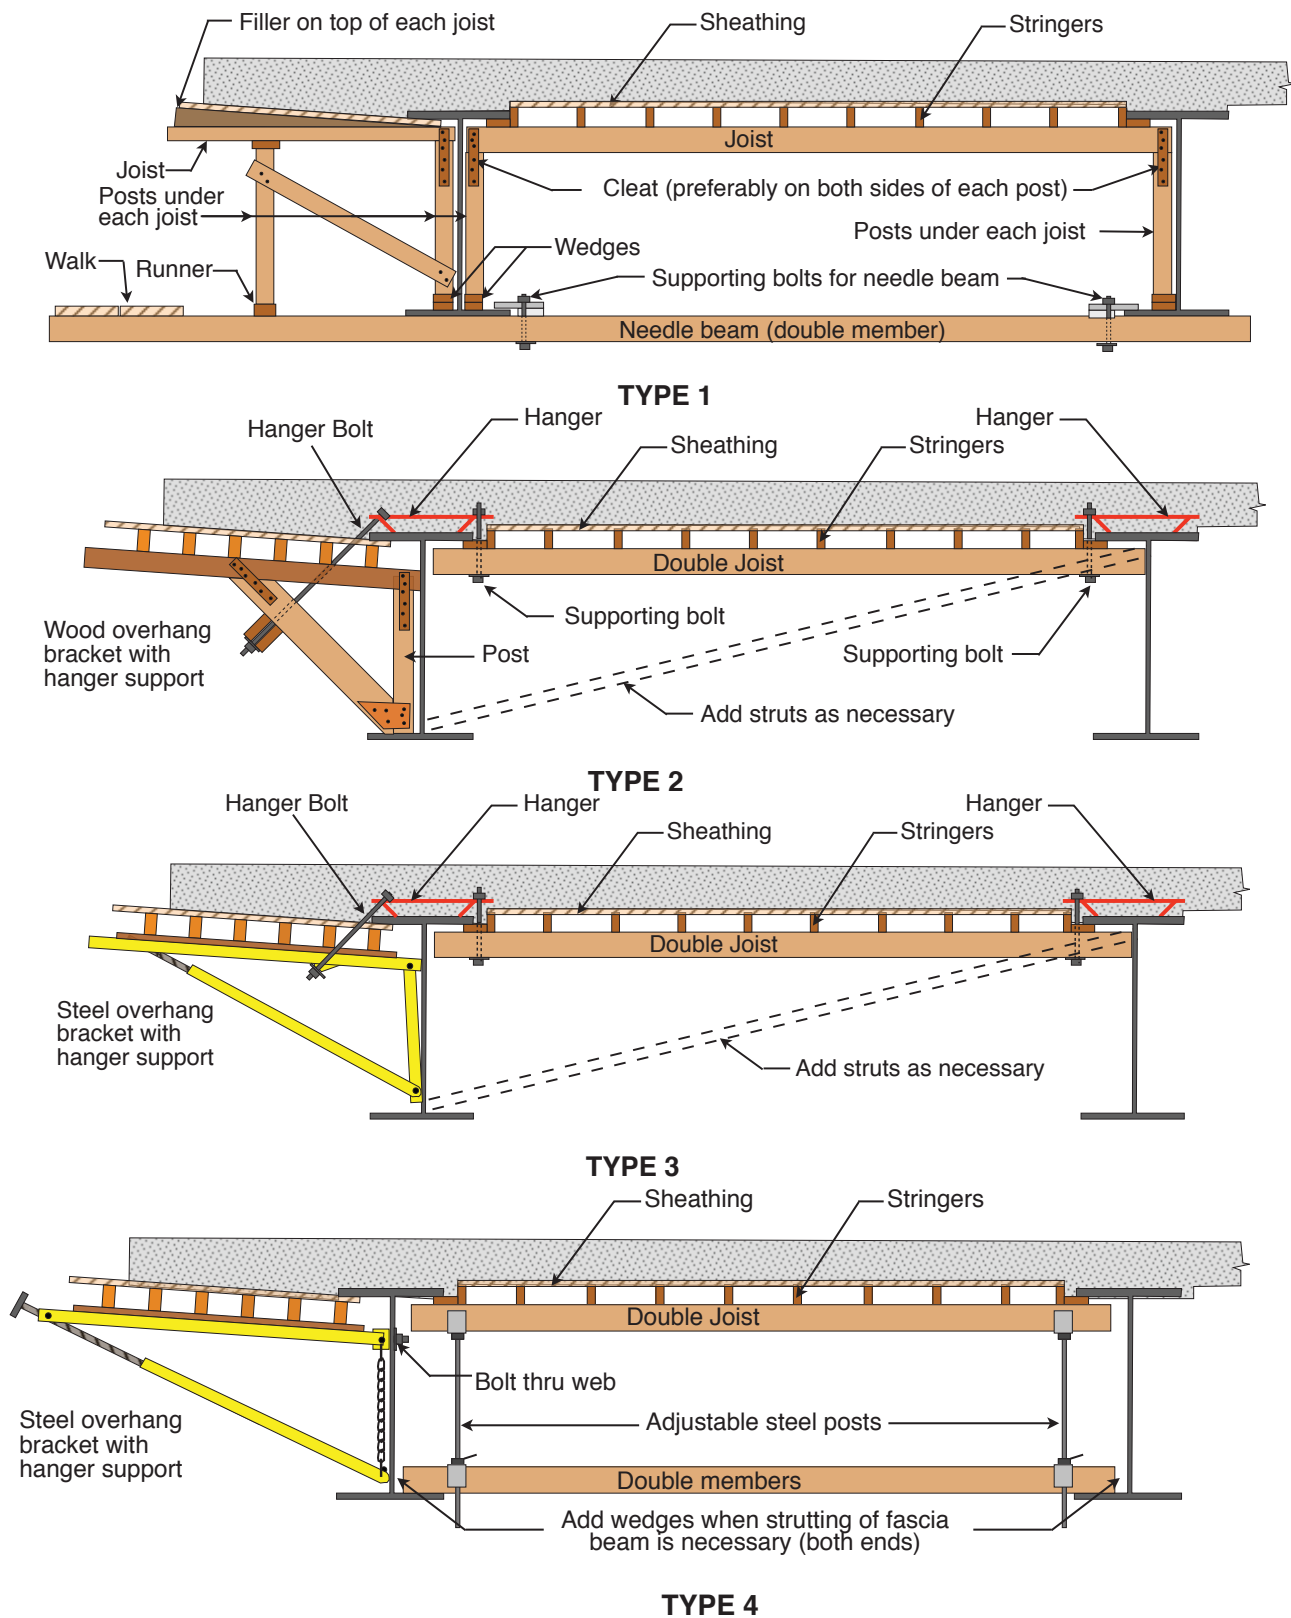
Details of several typical configurations used to support both roadway slab and overhang construction on bridges with steel beams.
